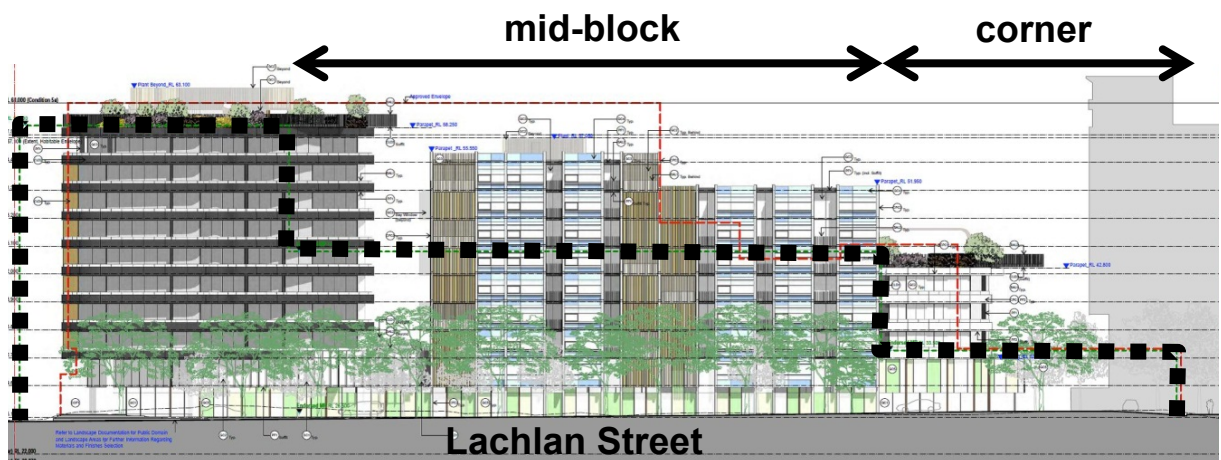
Diagram of proposed northern elevation compared to the masterplan envelope (dashed).
